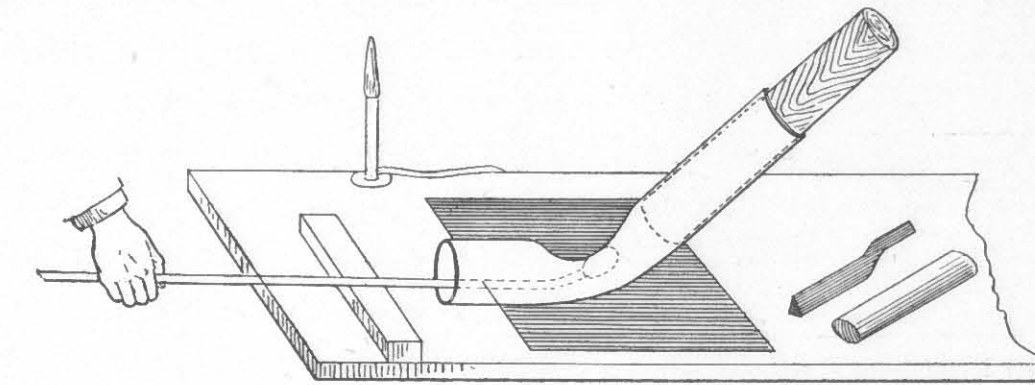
Bending Drawn-lead Pipe: 1st stage.
